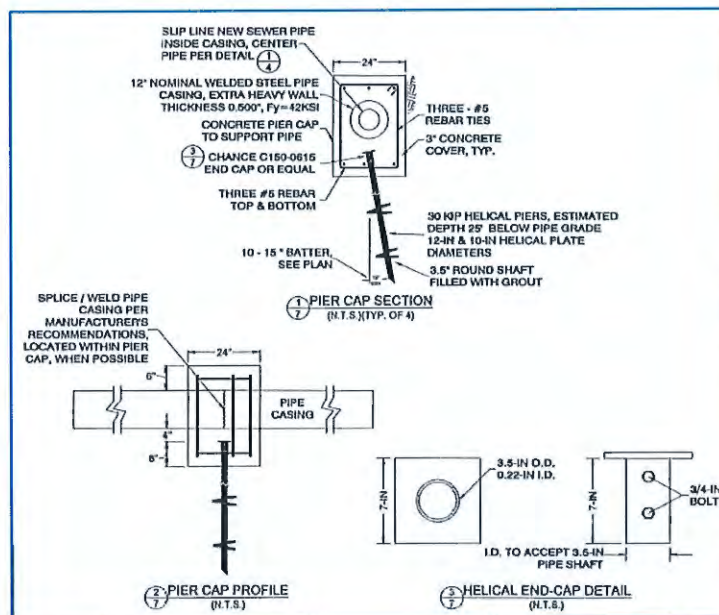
The Casing was designed with 4 helical piers drilled down to a refusal depth into hard ground, angled at ~15 degrees to give triangulated stability, and then secured to the welded steel casing with welded and bolted top flanges, steel rebar and concrete encasement. Details 2015.
